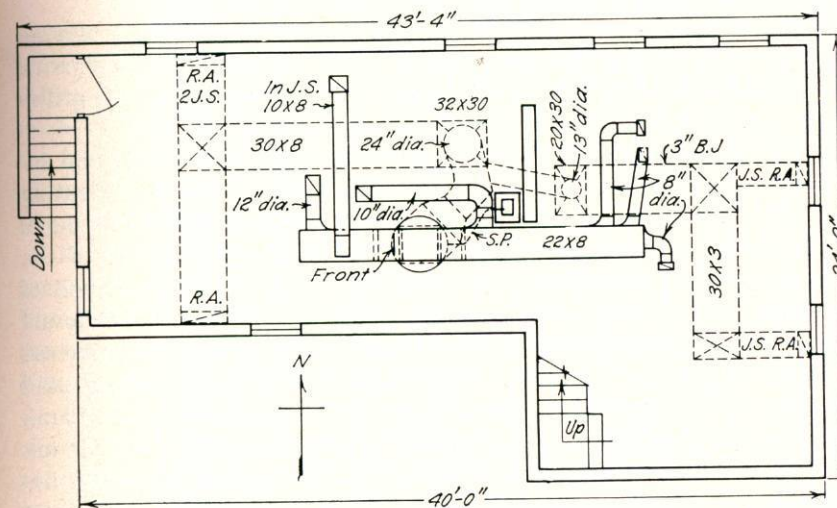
PLAN OF THE EXTENDED PLENUM DUCT SYSTEM
